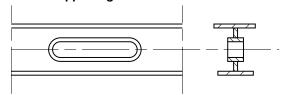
Stiffening of large openings in primary supporting members - Solution 2
